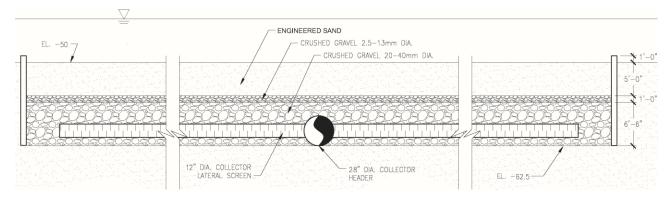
Seabed Infiltration Gallery (SIG) Cross Section
